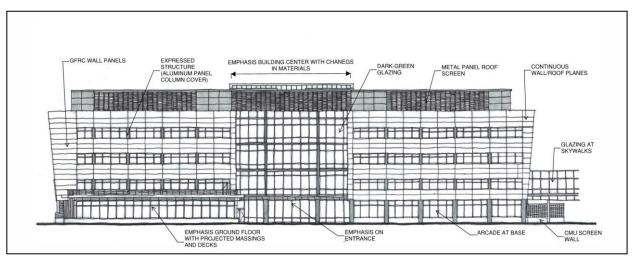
Building Façade examples – Elevation of NLB 1 at Gilead Campus
